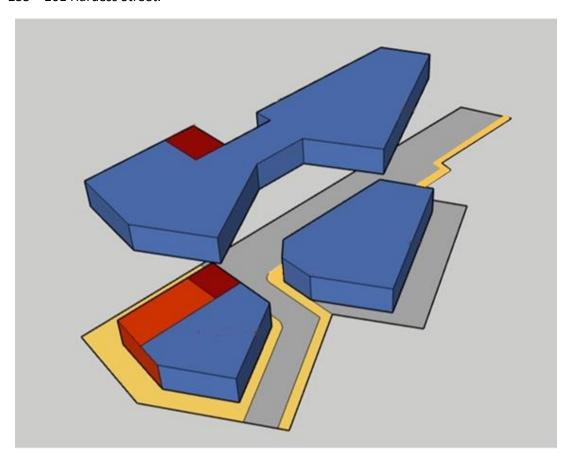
Exploded view from Southeast showing the road layout and ground and first floor accommodation. Yellow area is pedestrian footway, the blue accommodation at ground and first floor is light industrial and the red accommodation is the residential access and core.
